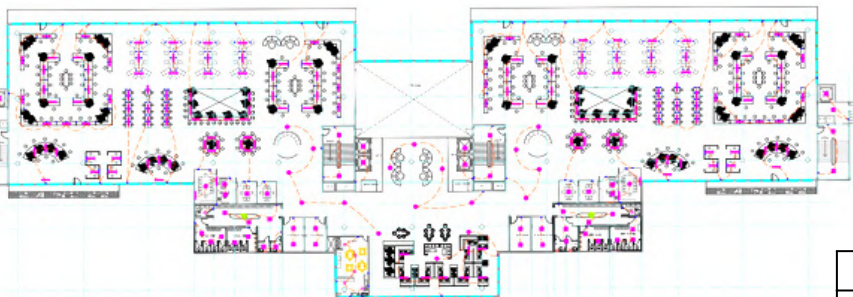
ELECTRICAL LAYOUT (TOWER B)
